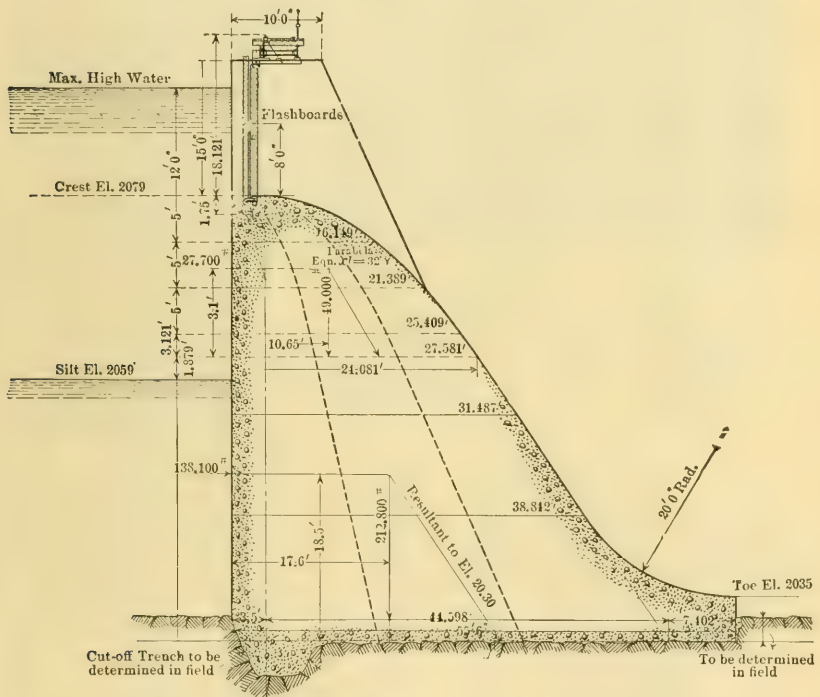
Cross-section of Masonry Gravity Dam Shown in Fig. 35.
